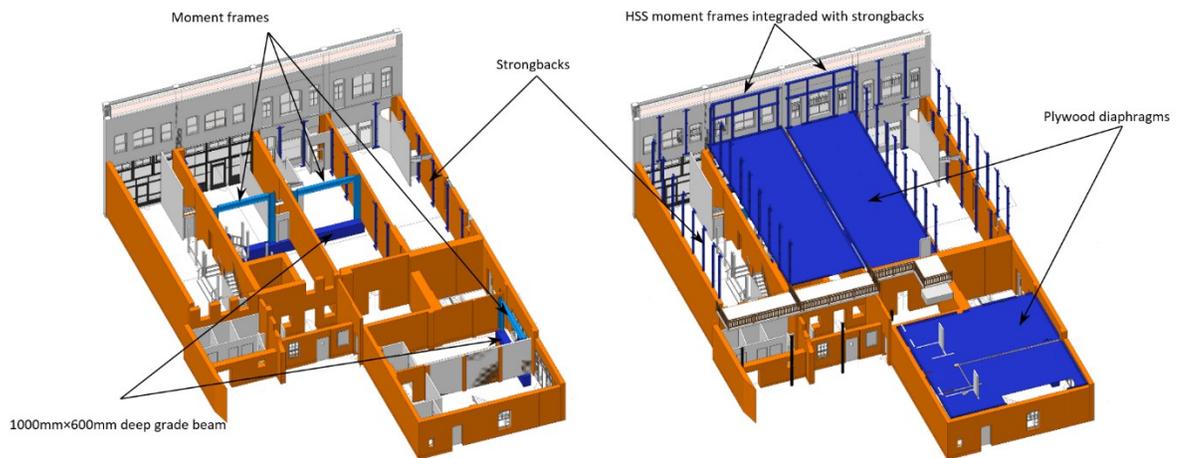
, a) Layout of HSS strongbacks and moment frames at level 1; b) Layout of HSS strongbacks, moment frames and plywood sheathings at level 2
